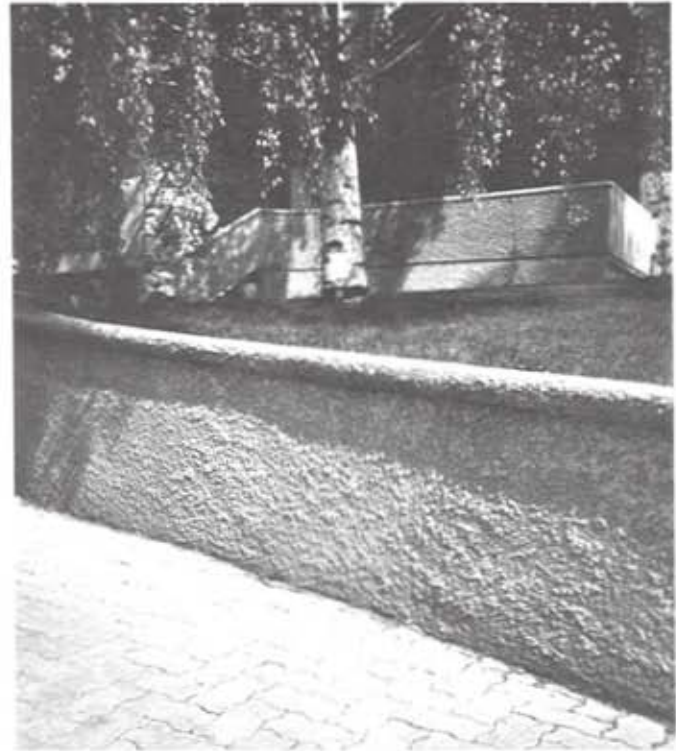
The stucco finish on this concrete wall enhances its texture and harmonizes with the building's façade.
